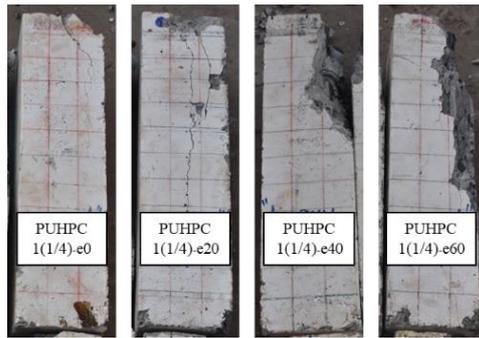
Failure of Concrete Columns Reinforced with Prefabricated Steel Tubes Filled with UHPC of 1/4 Inch Diameter (PUHPC1(1/4)).
